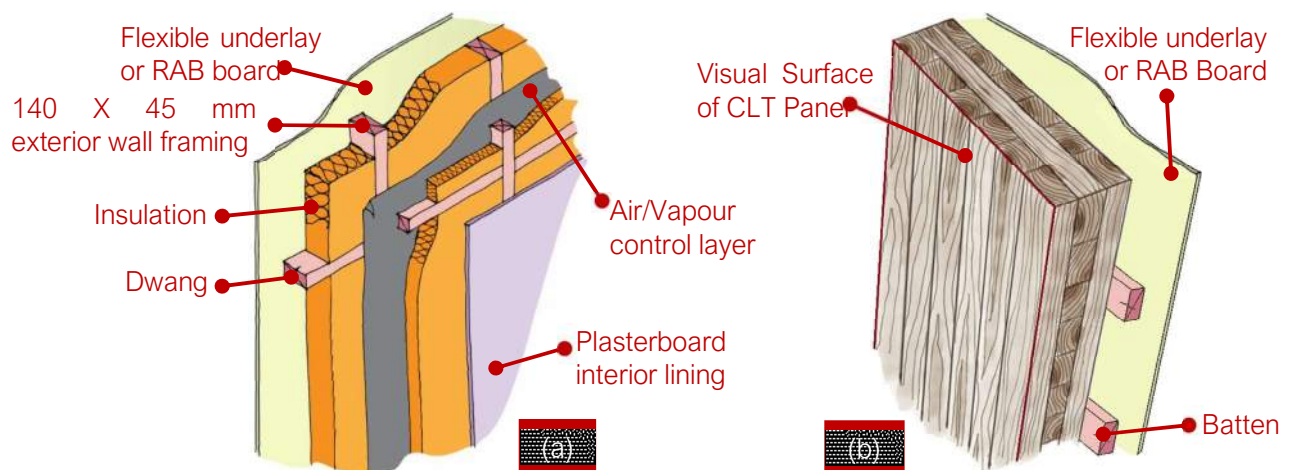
Timber construction systems; a) Timber frame and truss system, b) CLT composite system.
